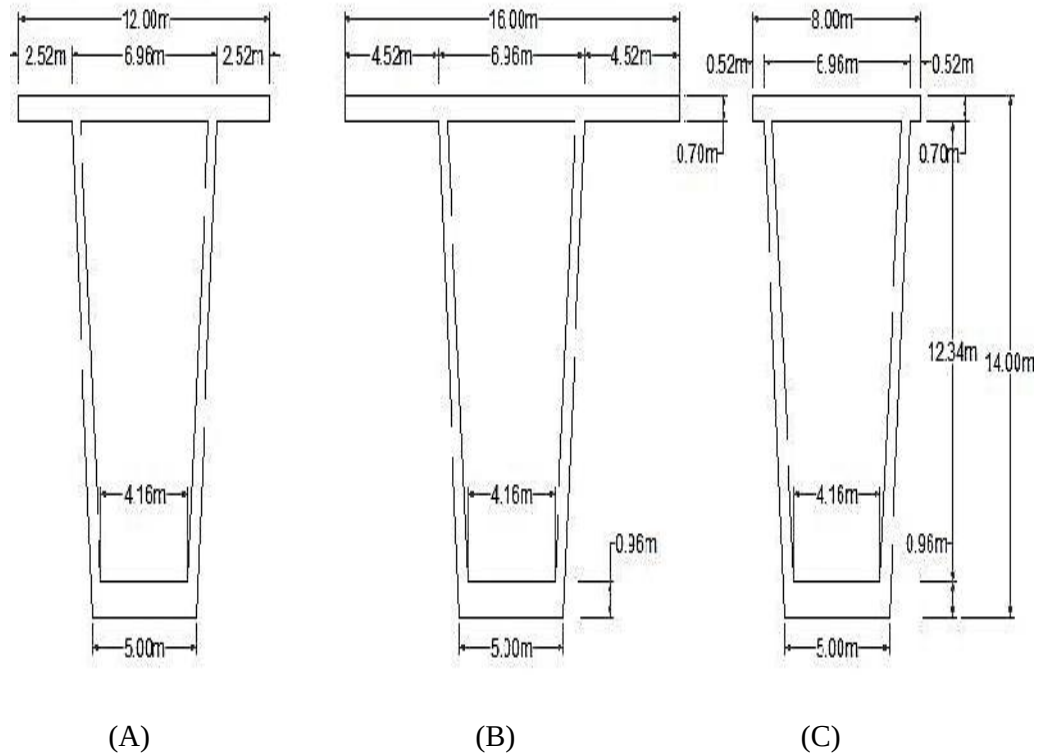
Analyzed cross sections in parametric study of the overhanging width: (A) overhanging width = 2.5 m (reference section), (B) overhanging width = 4.5 m and (C) overhanging width = 0.5 m.
